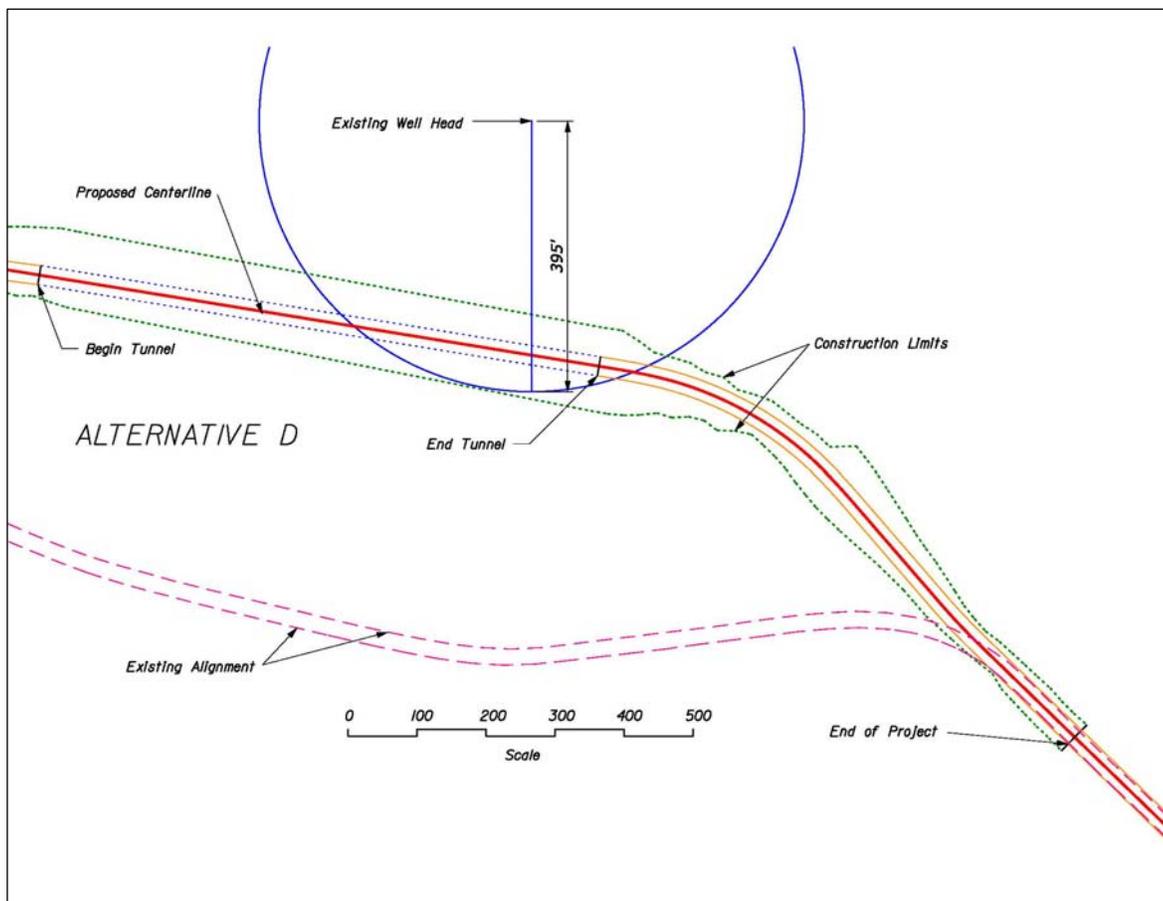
Alternative D alignment proximity to well 3 protection zone
